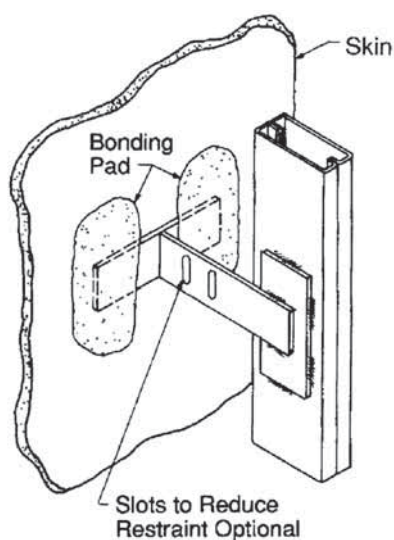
Plate gravity anchor. (Taken from Glass Fiber Reinforced Concrete Panels, Fourth Edition, PCI. Used with permission, Precast/Prestressed Concrete Institute.)
